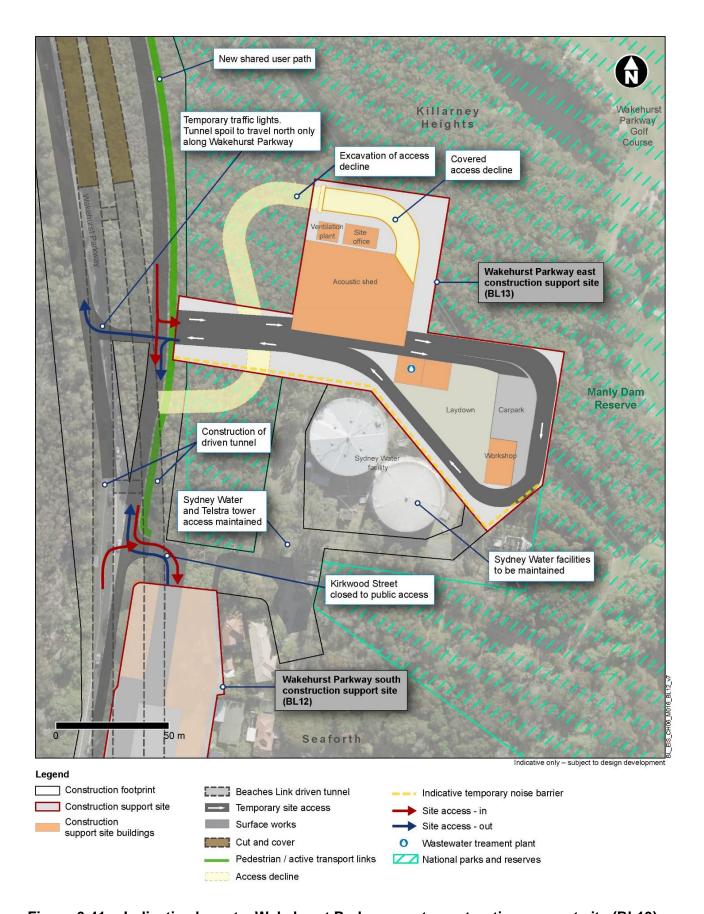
Indicative layout – Wakehurst Parkway east construction support site (BL13)
